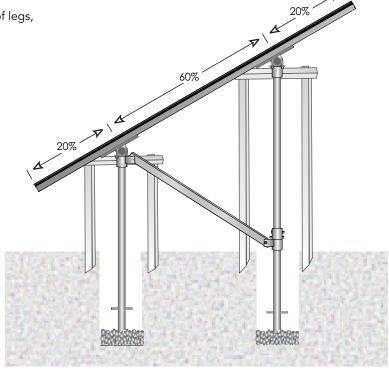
FULL-TRUSS OPTION Footing holes should extend below the frost line. You may elect to use a few inches of gravel at the base of the holes to promote drainage. Loosely assemble the full truss structure, using wood supports to stabilize vertical and horizontal pipes. When cross braces and rails are in place, square up the array and tighten fastensers. Pour concrete after array is fully assembled, save for the modules themselves. See page 8 of this manual for installation notes.
